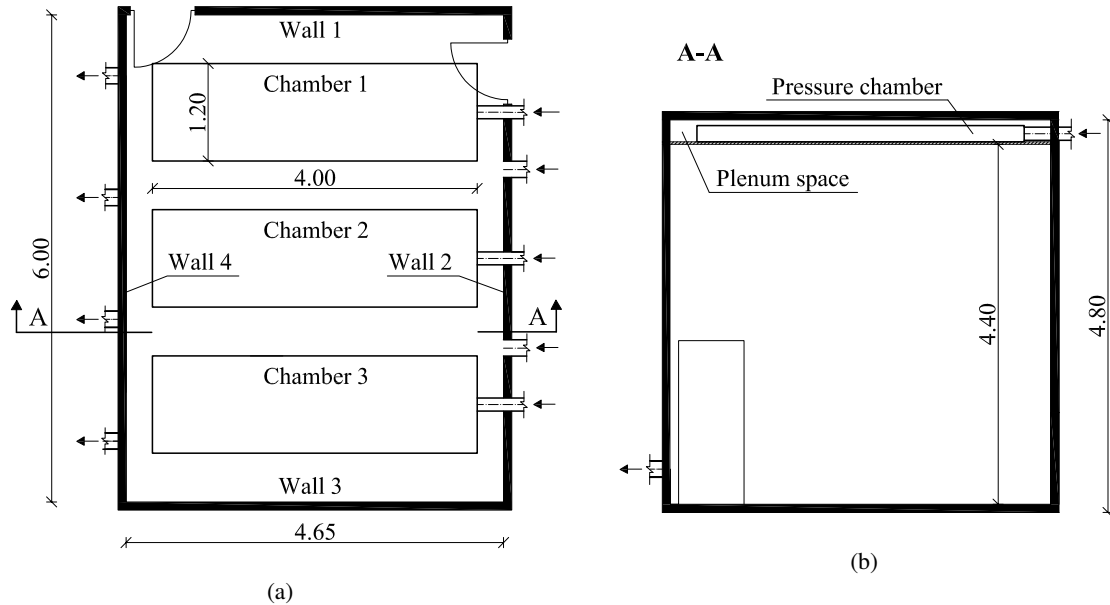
Schemes of the test room a) plan view, b) cross-section.
